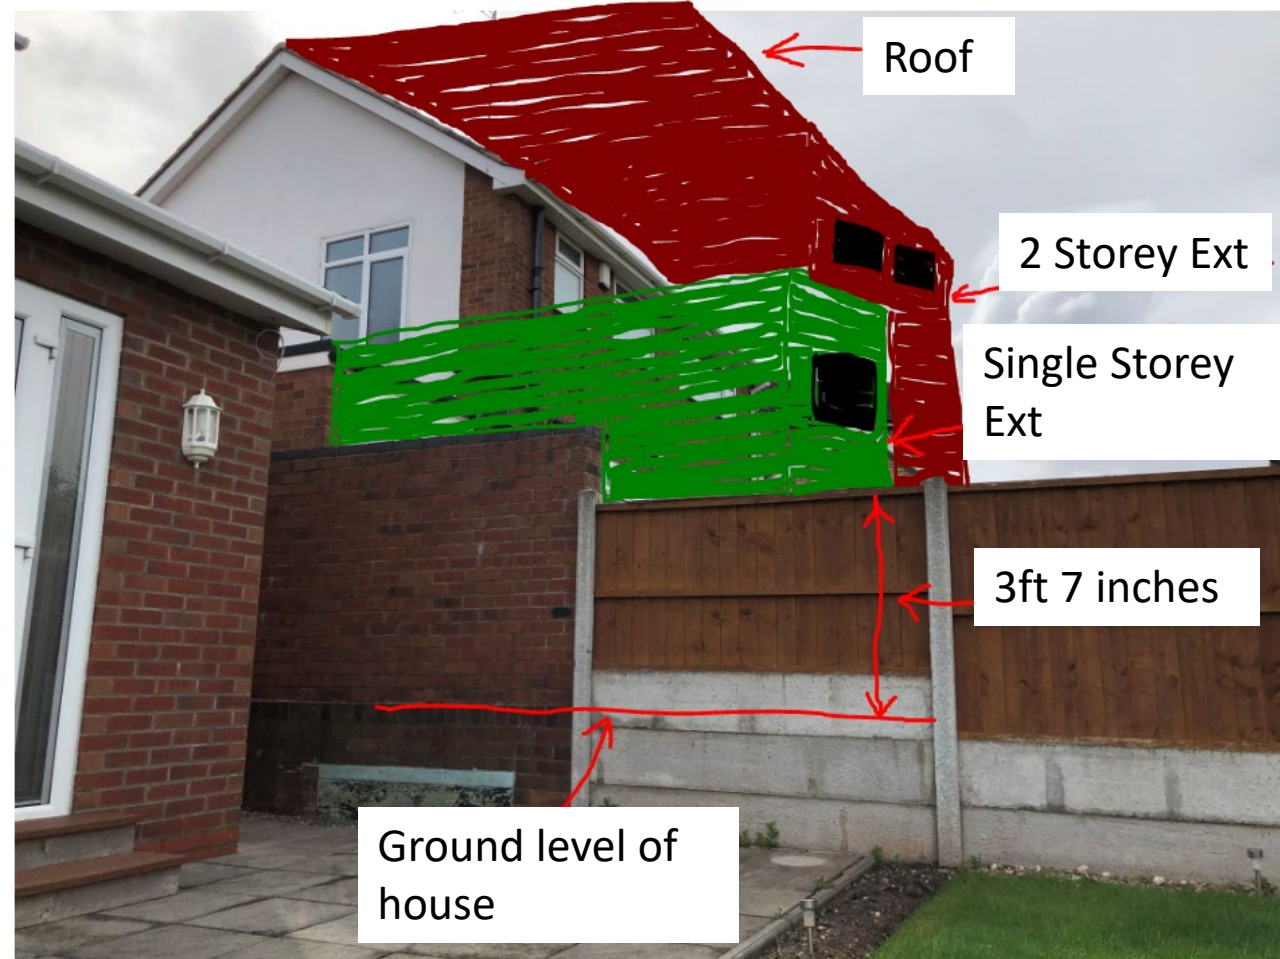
Picture taken from neighbouring 29 Monksfield Avenue illustrates proposed extension and elevation (right).
